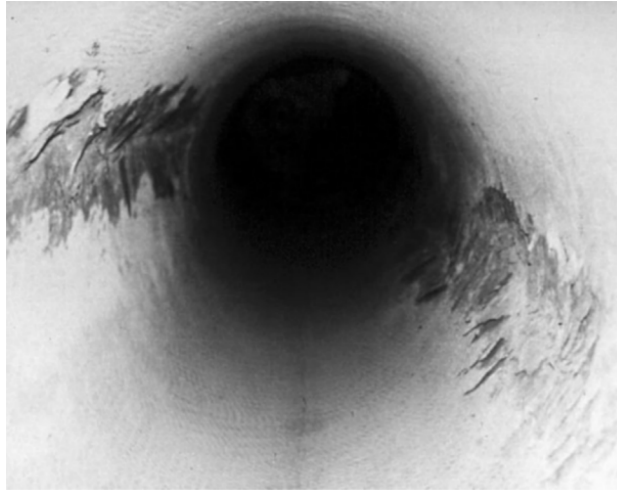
Mild spalling of wall rock in a raise boring shaft (from: Hoek and Brown (1980b))
